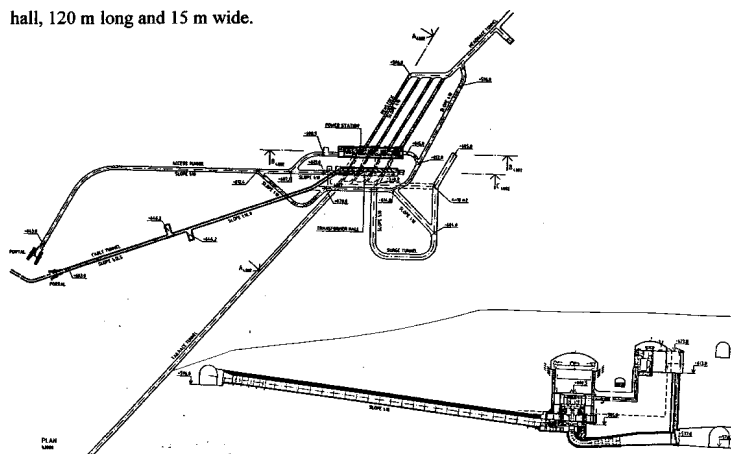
Neelum-Jhelum HPP- Powerhouse Cross-Section
